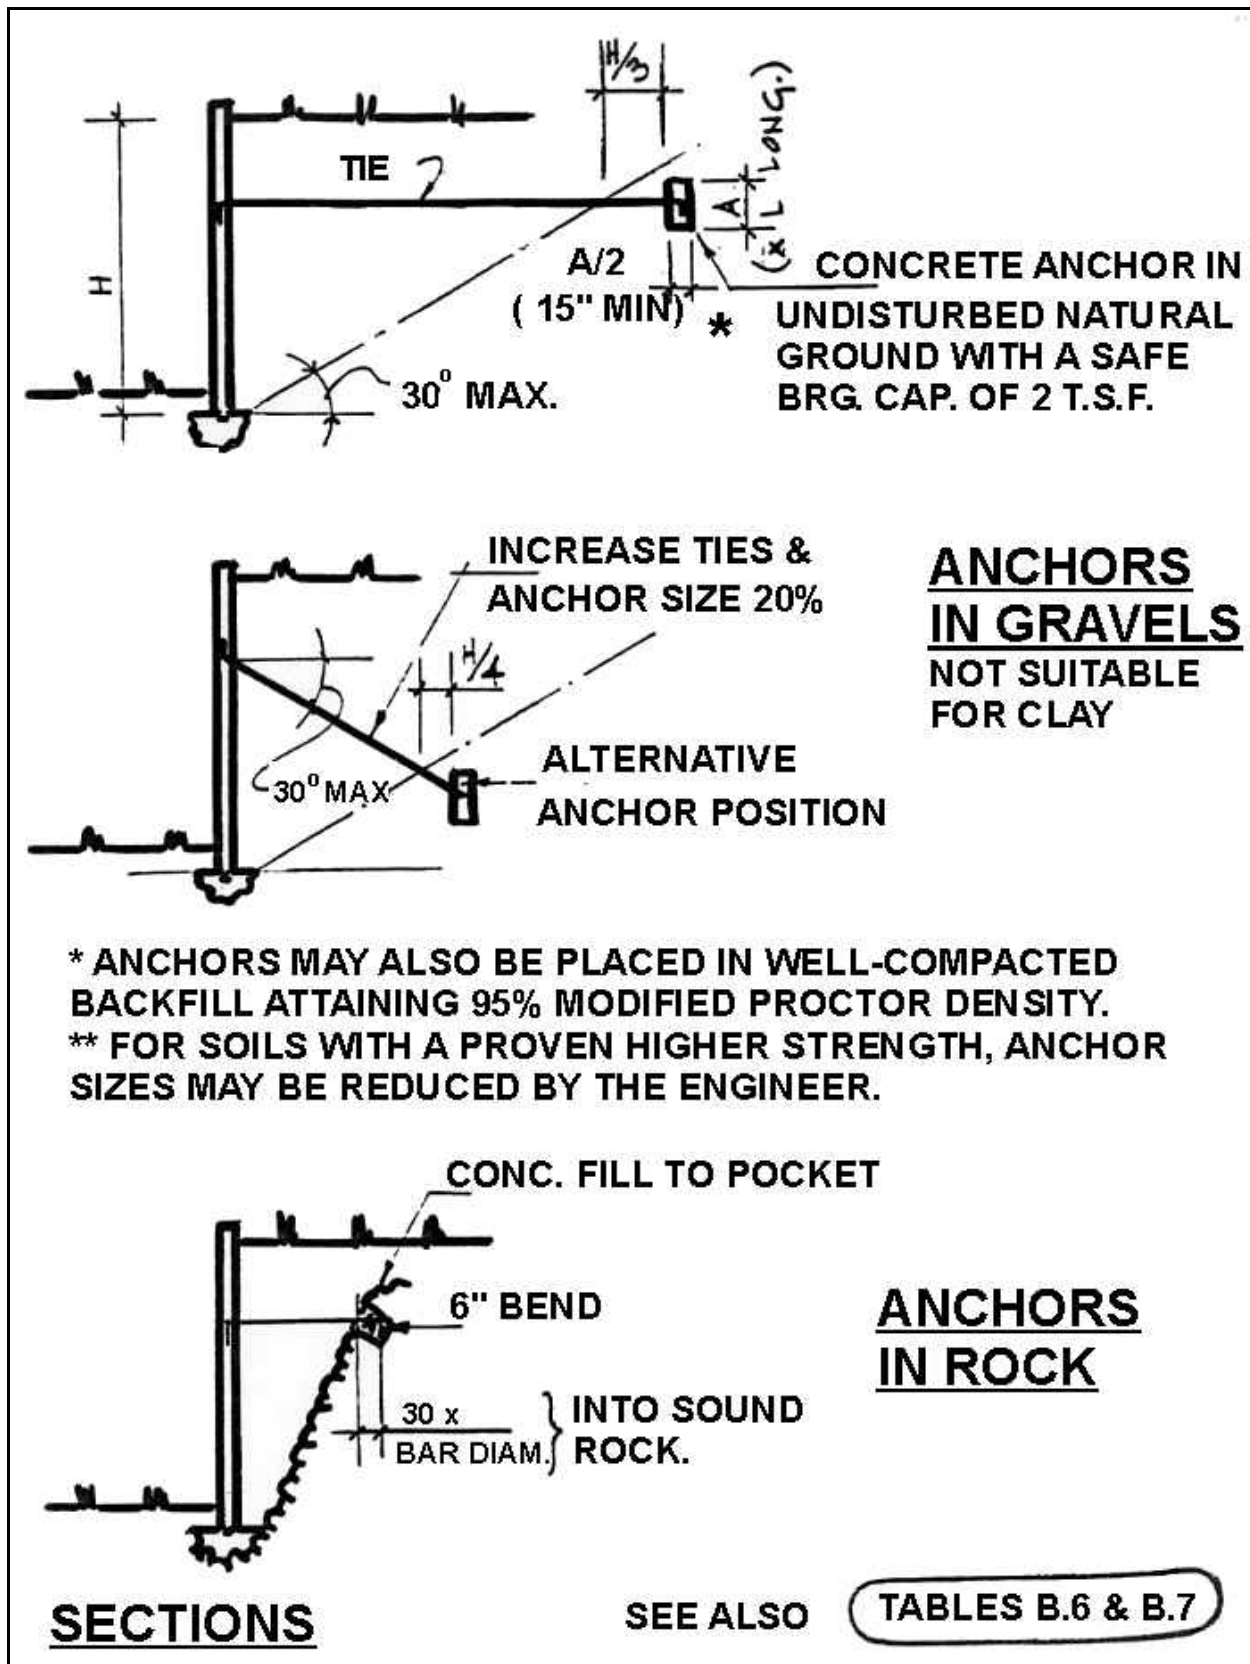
Concrete retaining wall with tie-back to anchor, H = 0 to 32 feet (Bernier, 1995).
